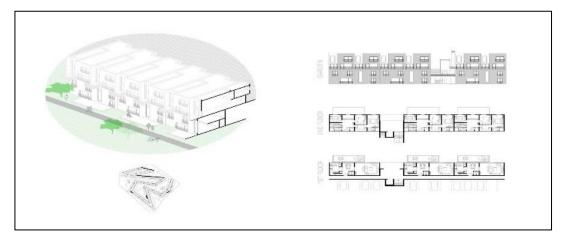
Isometric View and Floor Plans of Ulukent 35<sup>th</sup> Street Apartments, Istanbul, (Cemal Emden, 2011)
